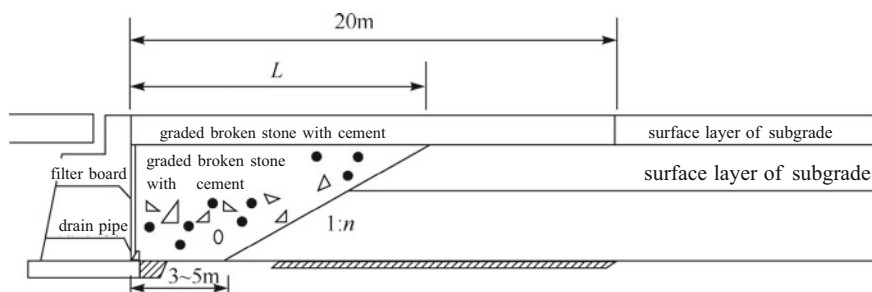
Transition section with longitudinal inverted trapezoidal graded broken stone along the line
